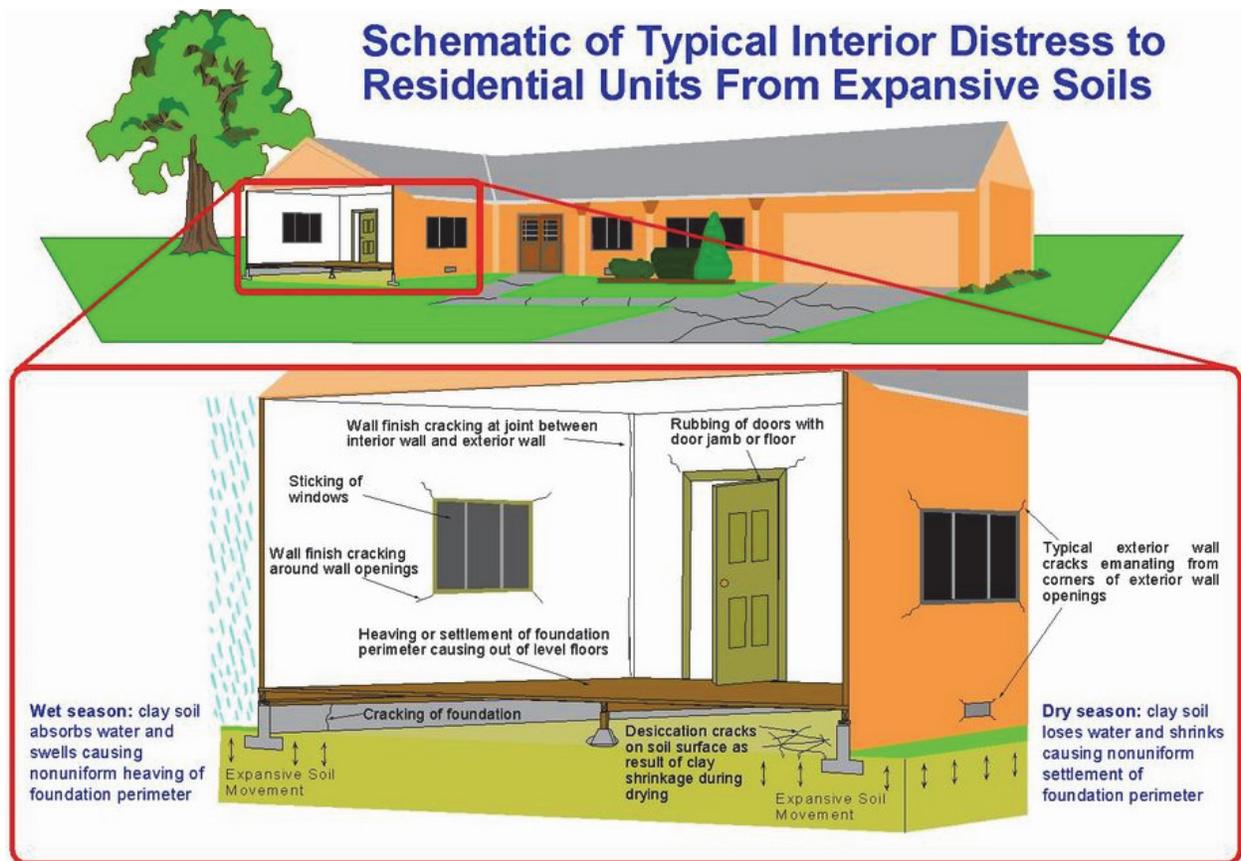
Schematic of typical long-term, non-earthquake distress caused by expansive soil to the interior of a residential building with a perimeter concrete foundation (image credit: Exponent).
